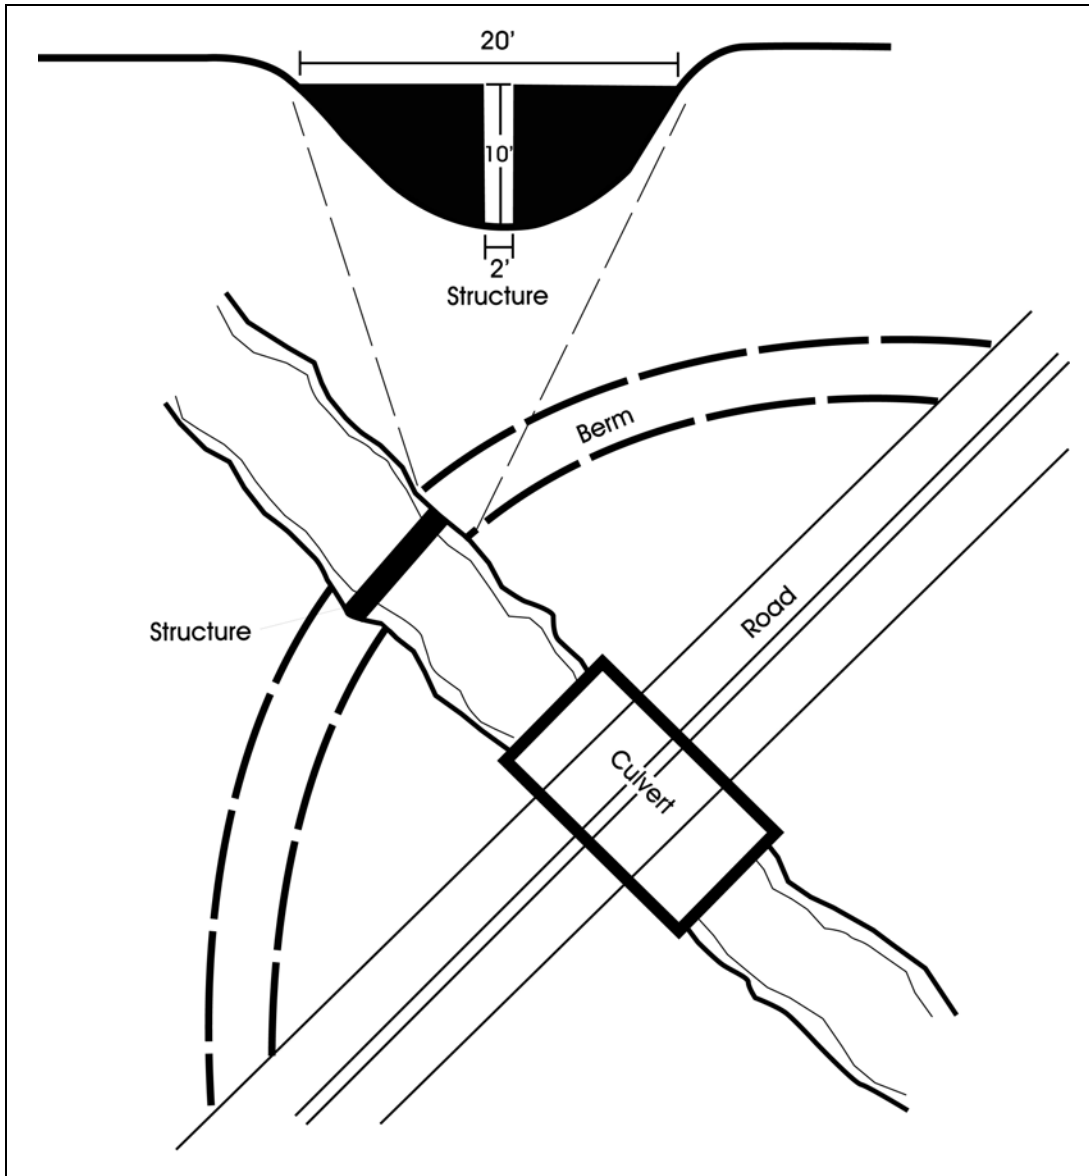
PROPOSED BERM AND WEIR STRUCTURE
